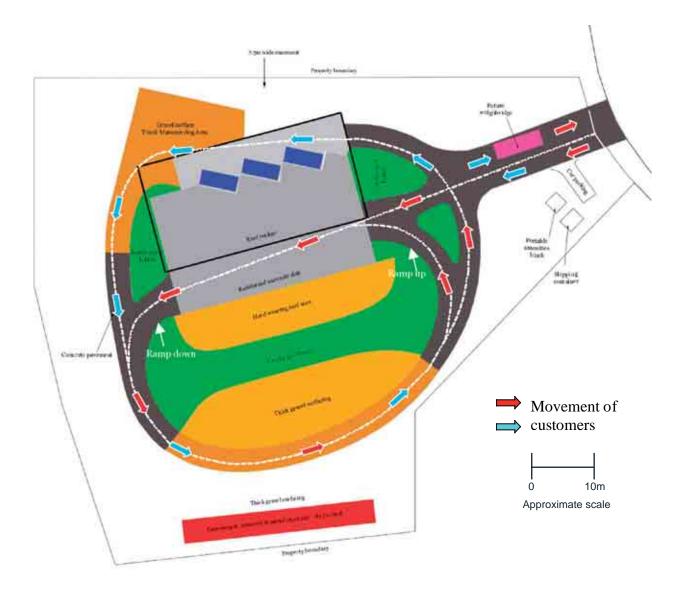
Site layout of Wauchope transfer station (Schematic only, sizes are approximate).
